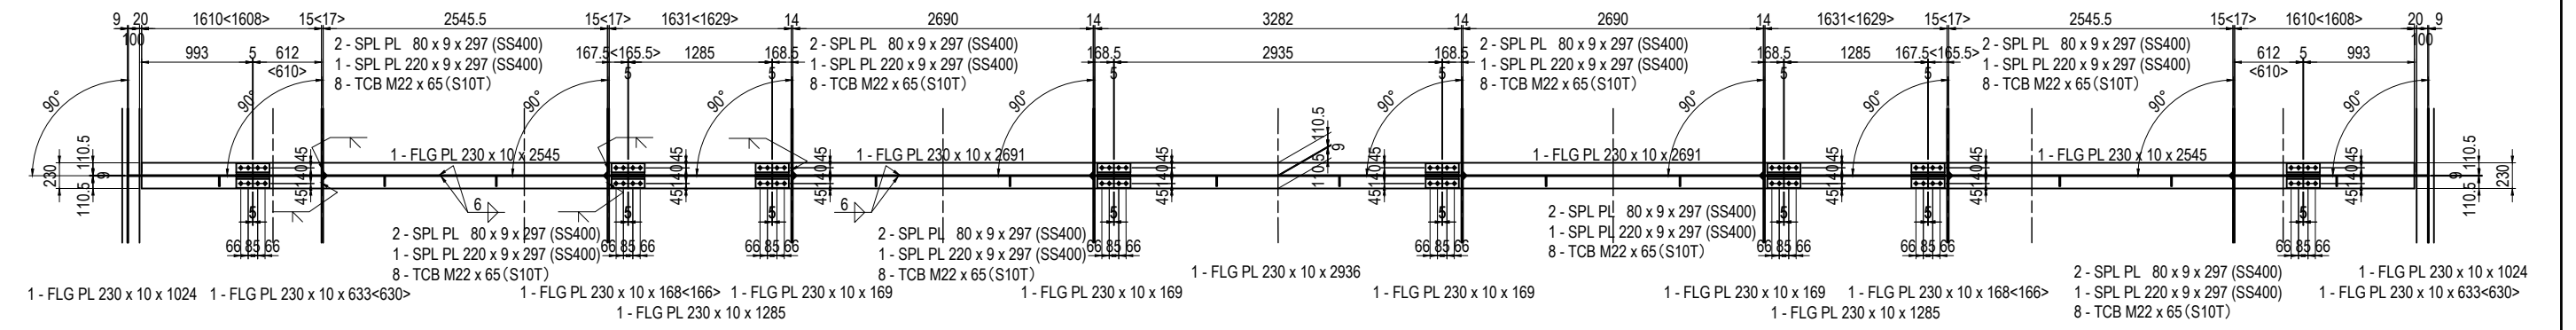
DETAIL OF CROSS BEAM SECTION (12) S=1:60
